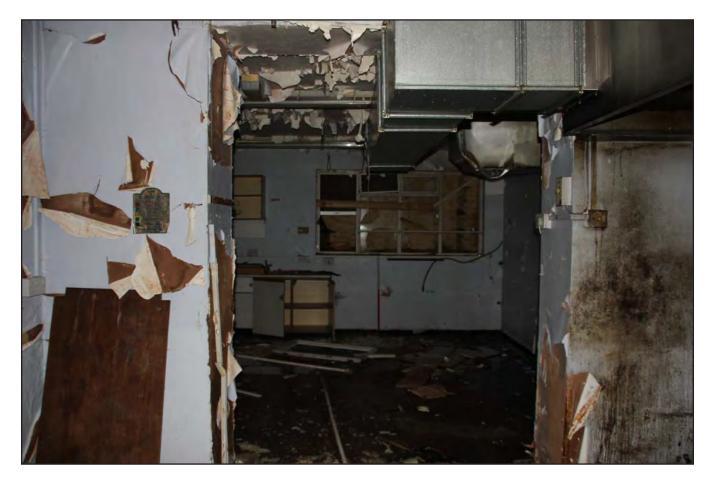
The Whitehouse Hotel ground floor Kitchen, from the southeast. Scale 1.0m.
